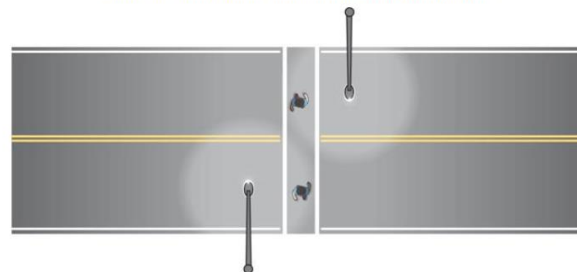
Drawing. New design for midblock crosswalk lighting layout.
